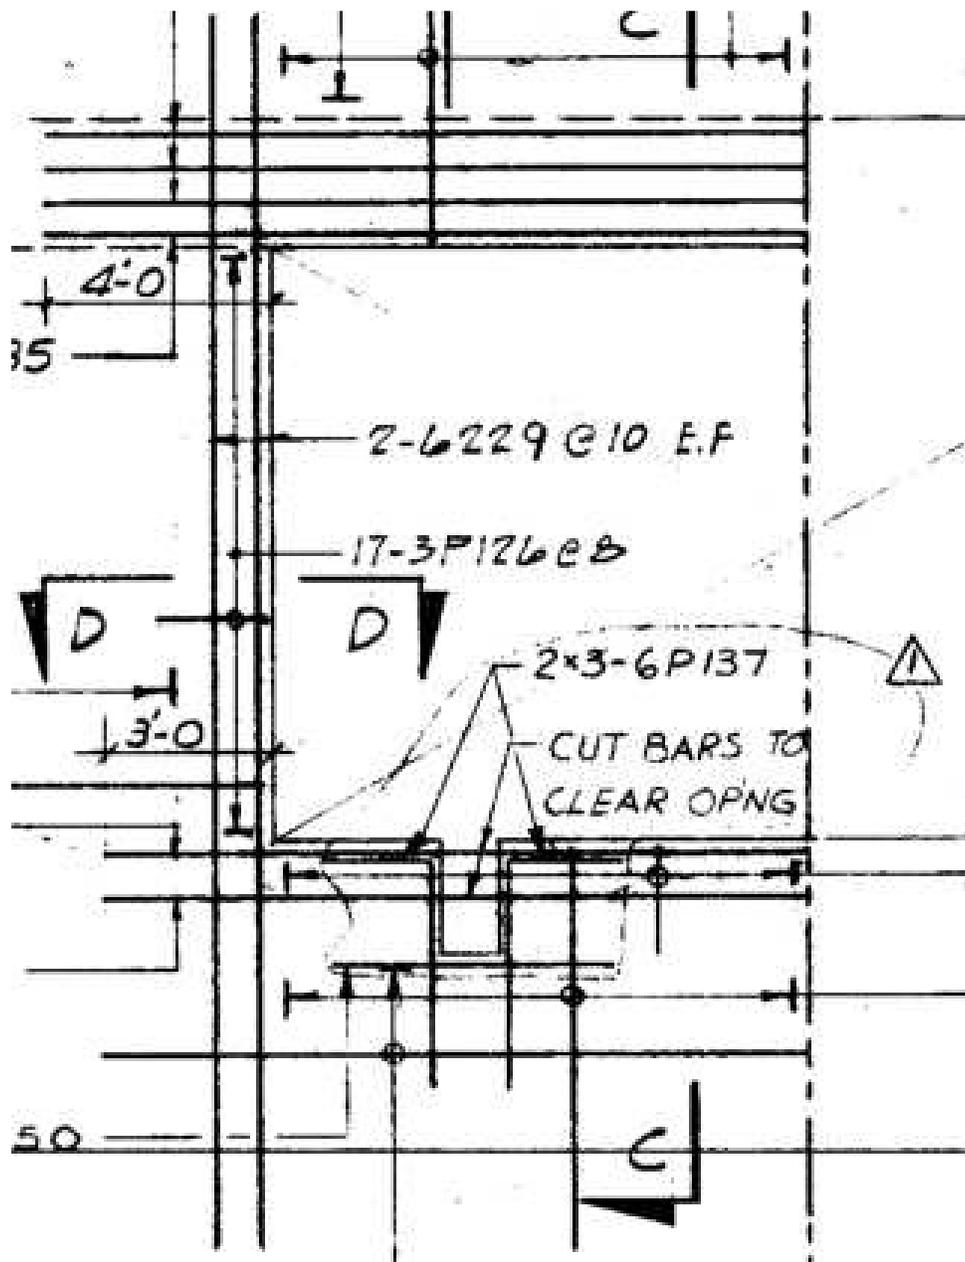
Reinforcement detail of the first storey opening (CFHT, 1974, with permission)
